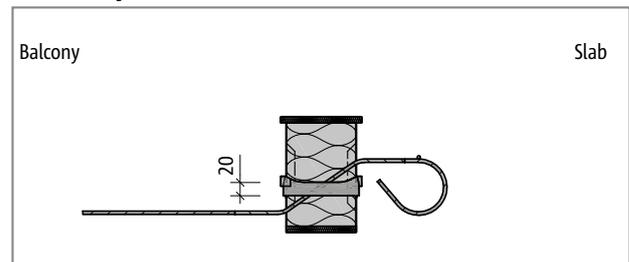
Schöck Isokorb® XT type Q-V1 to V4: Product section
